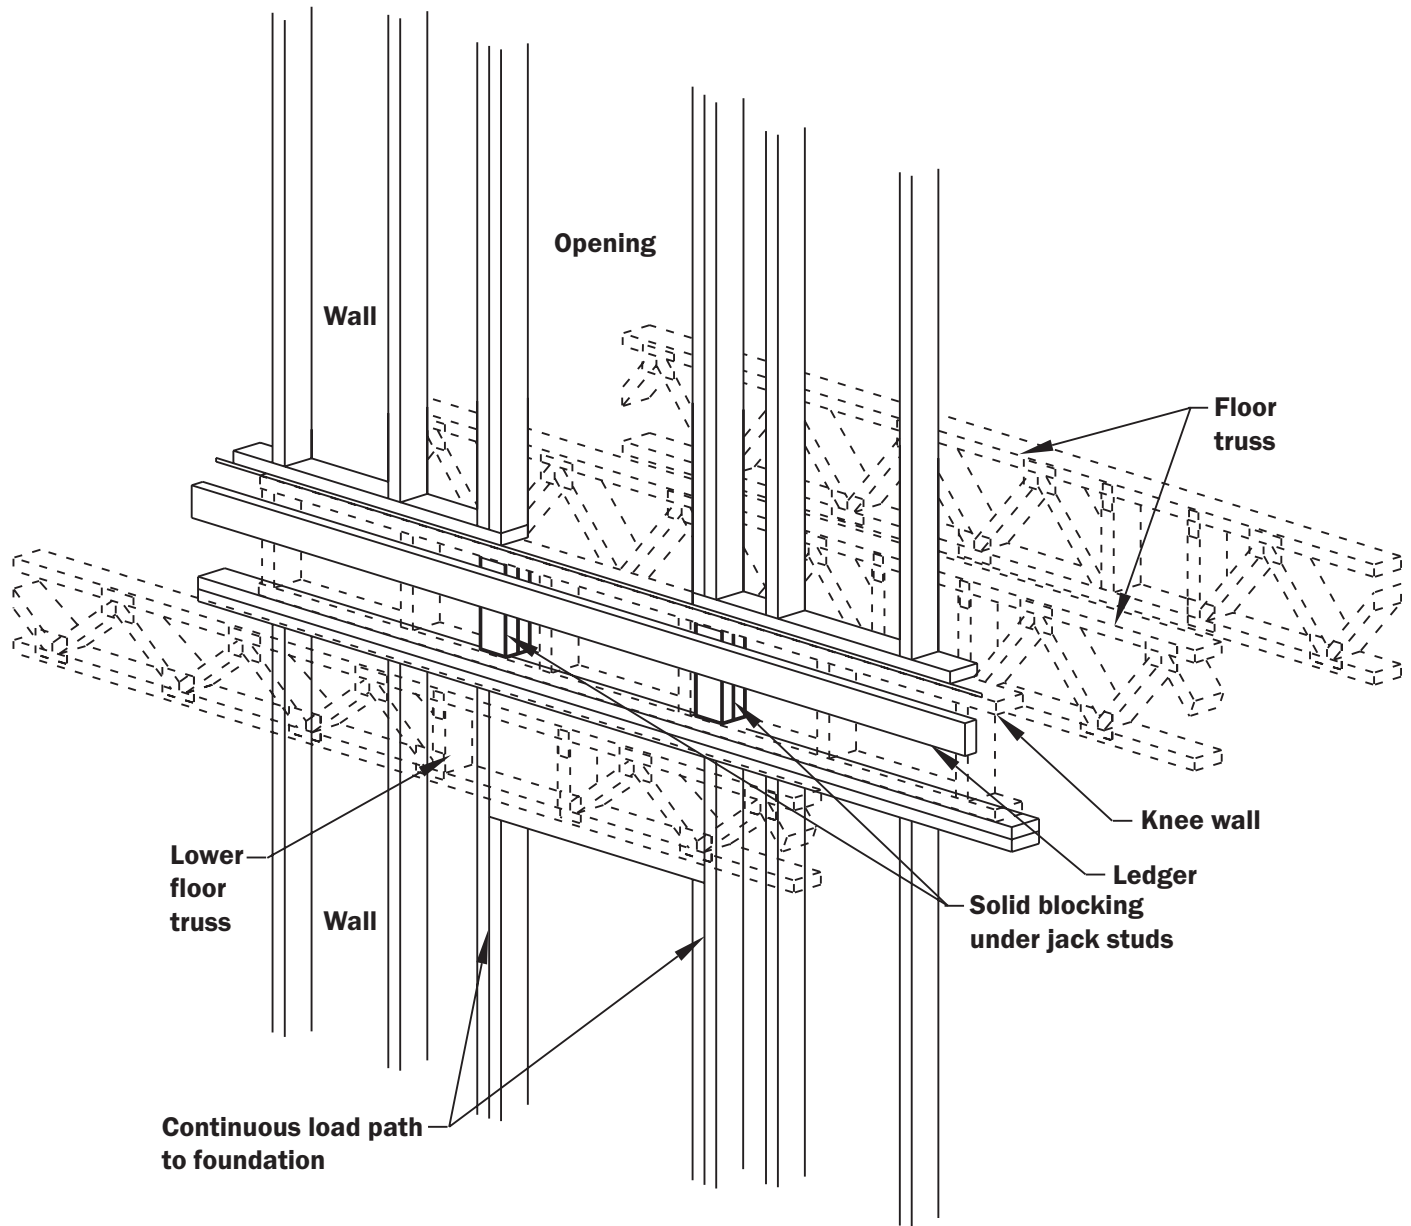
Blocking in Floor Space at Floor Elevation Change
